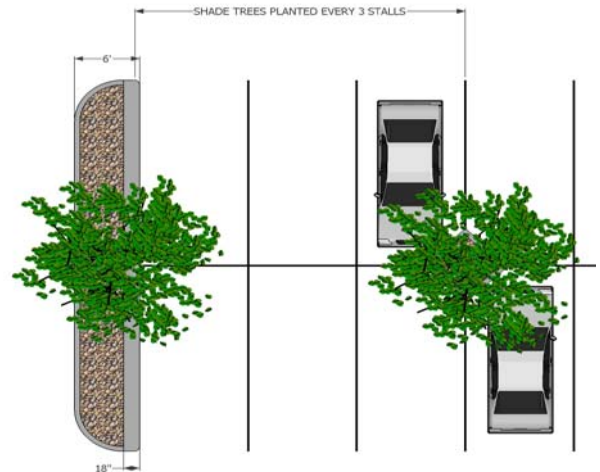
Parking lots shall contain landscaped areas every three stalls with landscape islands six (6) feet in width at the end of all parking blocks.
